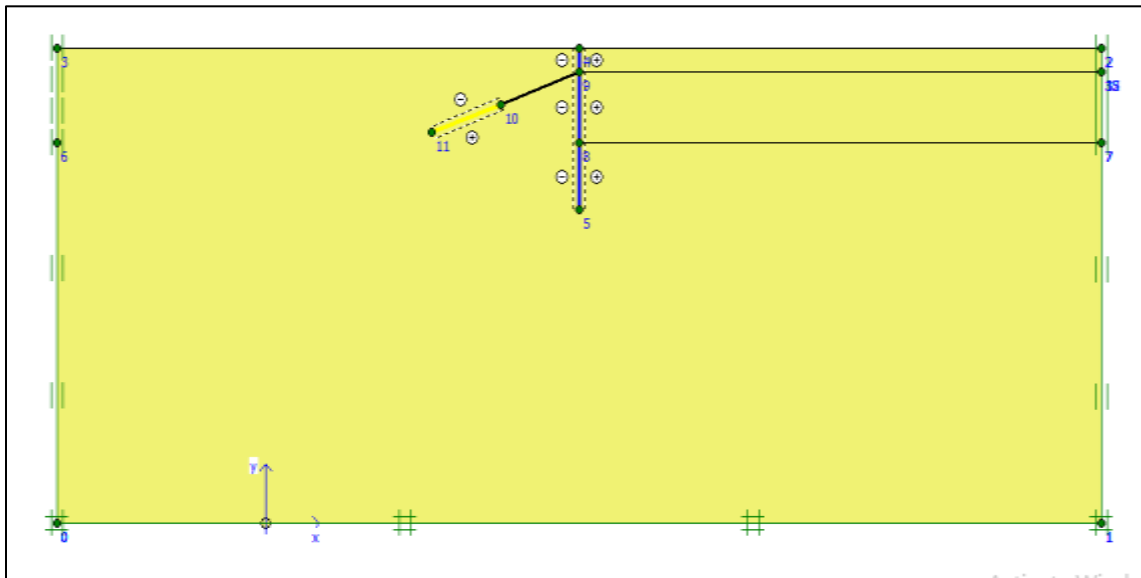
Schematic of Anchored Sheet Pile Wall and Penetration Depths Analyzed
